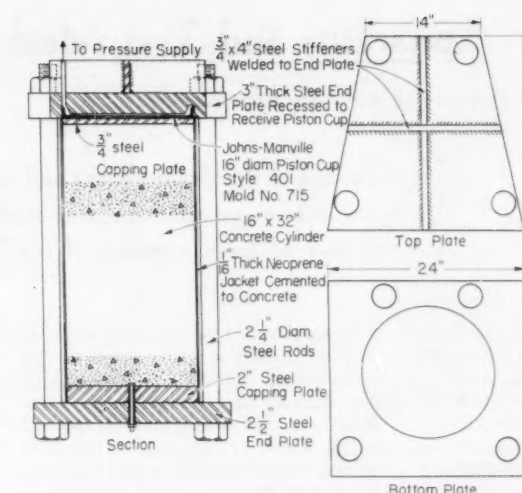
Loading frame for 16 by 32-in. concrete cylinder.
